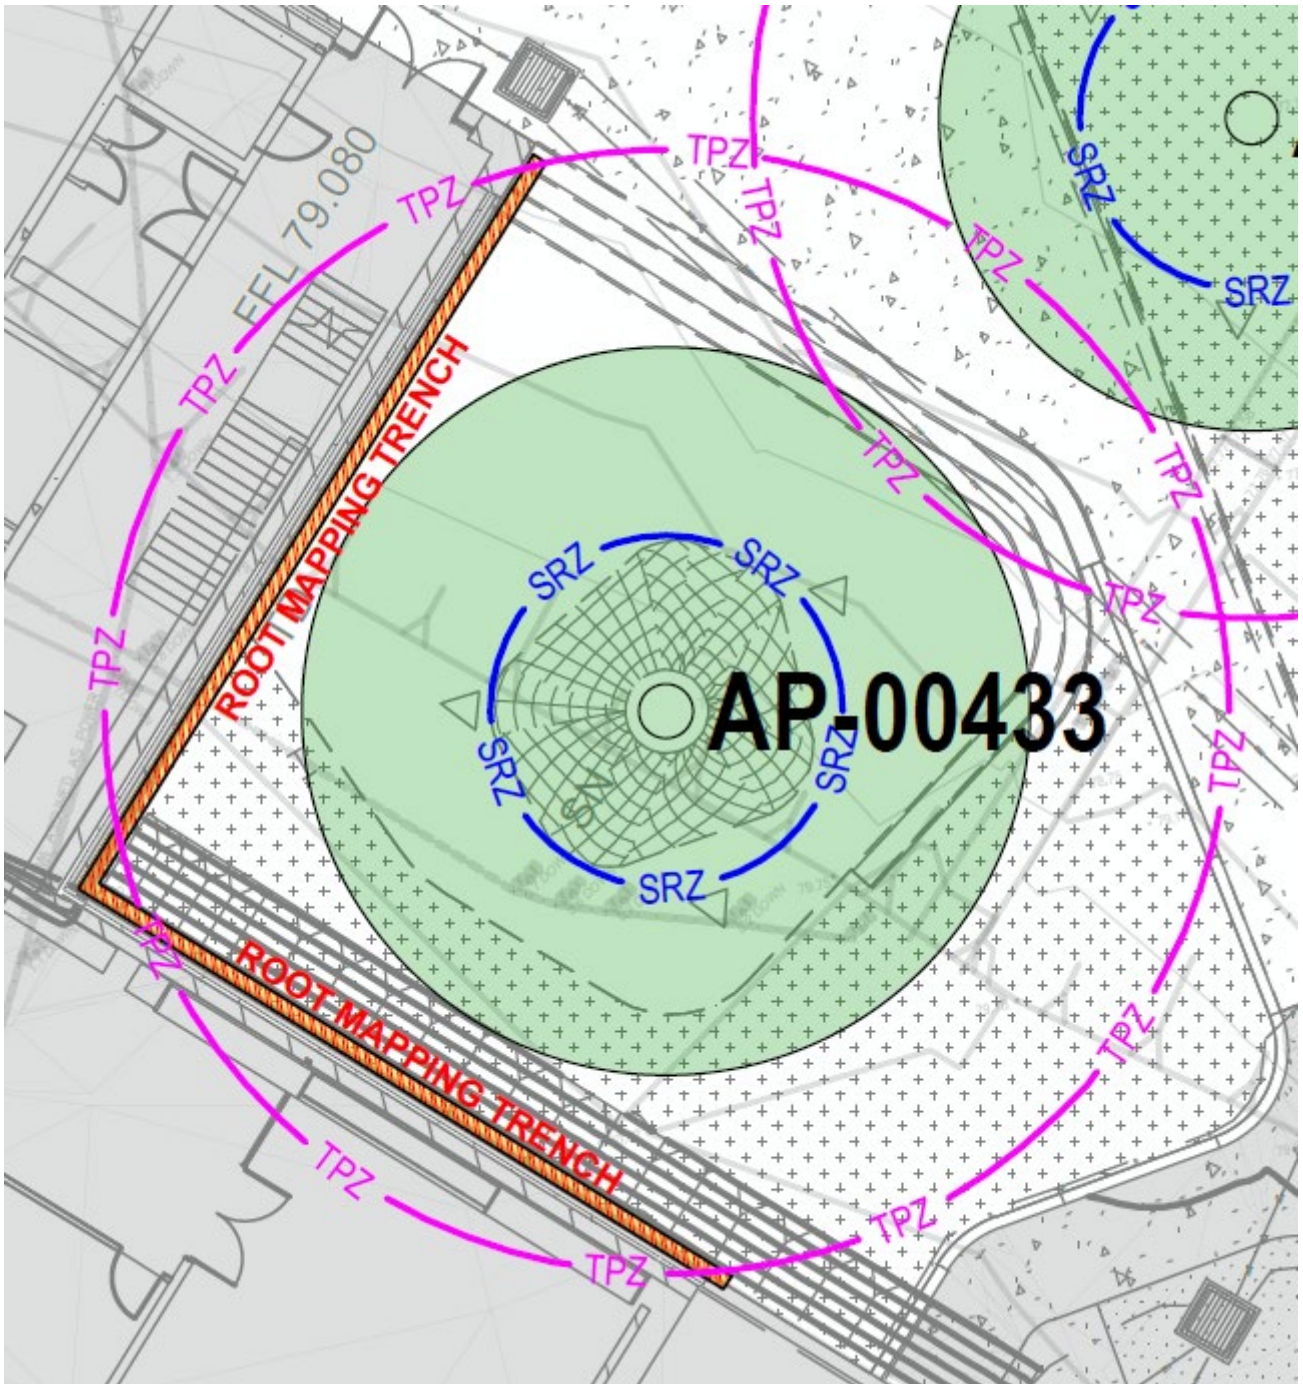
Tree Location Plan extract showing the extent of the excavated root mapping trench.
